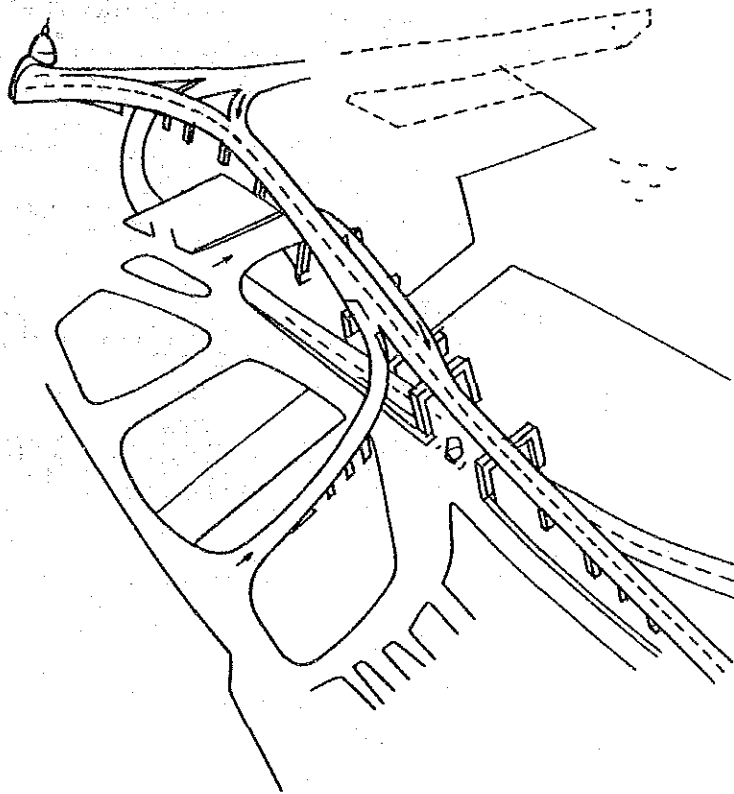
Image Plan of Port Highway and Overpass
